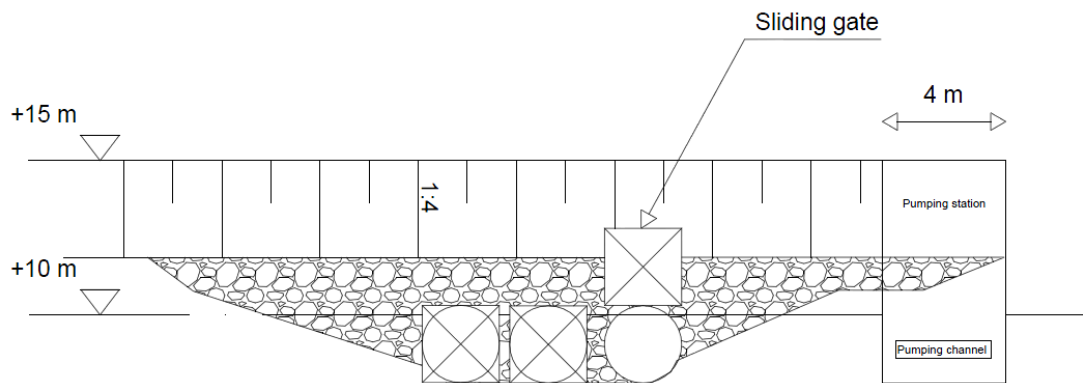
Sliding gate; Kvillebäcken; front view [ref 1]
